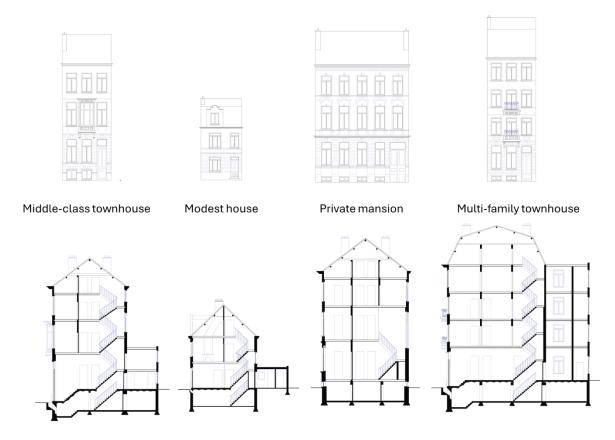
Overview of the Belgian townhouse archetypes by facade and section.
